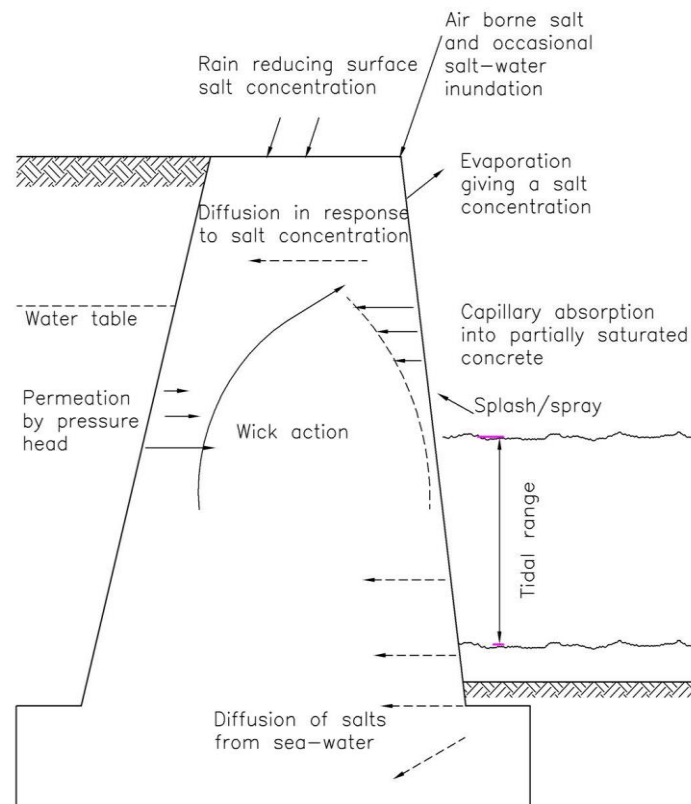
Various transport mechanisms in concrete sea wall (adopted from CS 109, 1996)
